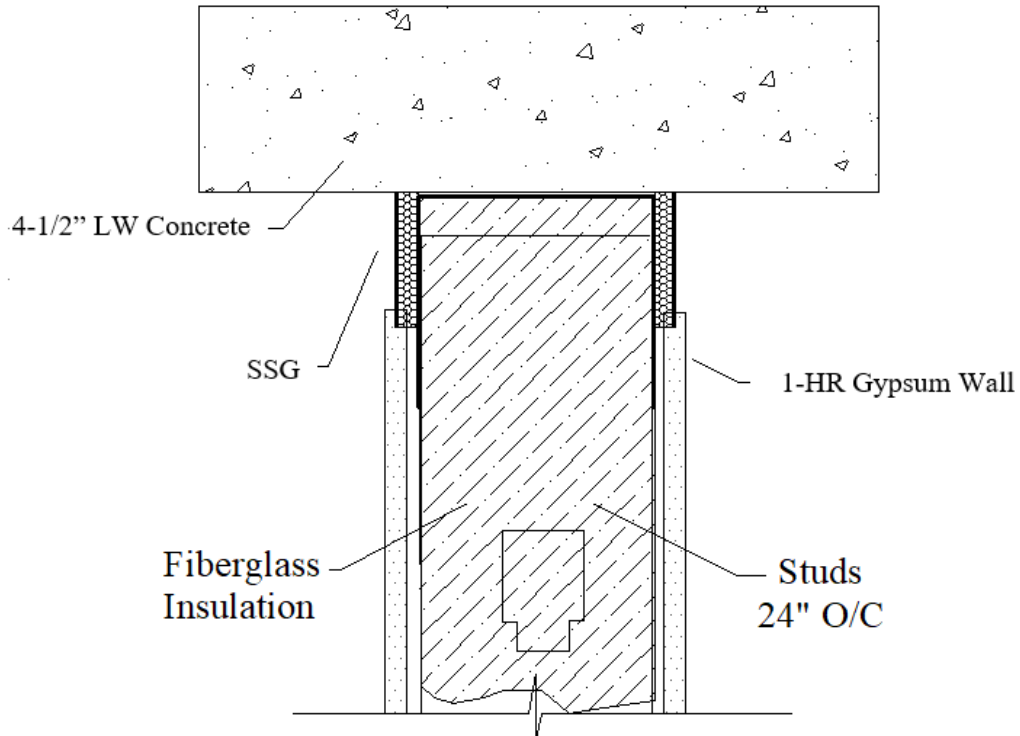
CAD rendering of head of wall joint showing the SSG installed on both legs of ceiling runner behind the layer of gypsum wallboard.
